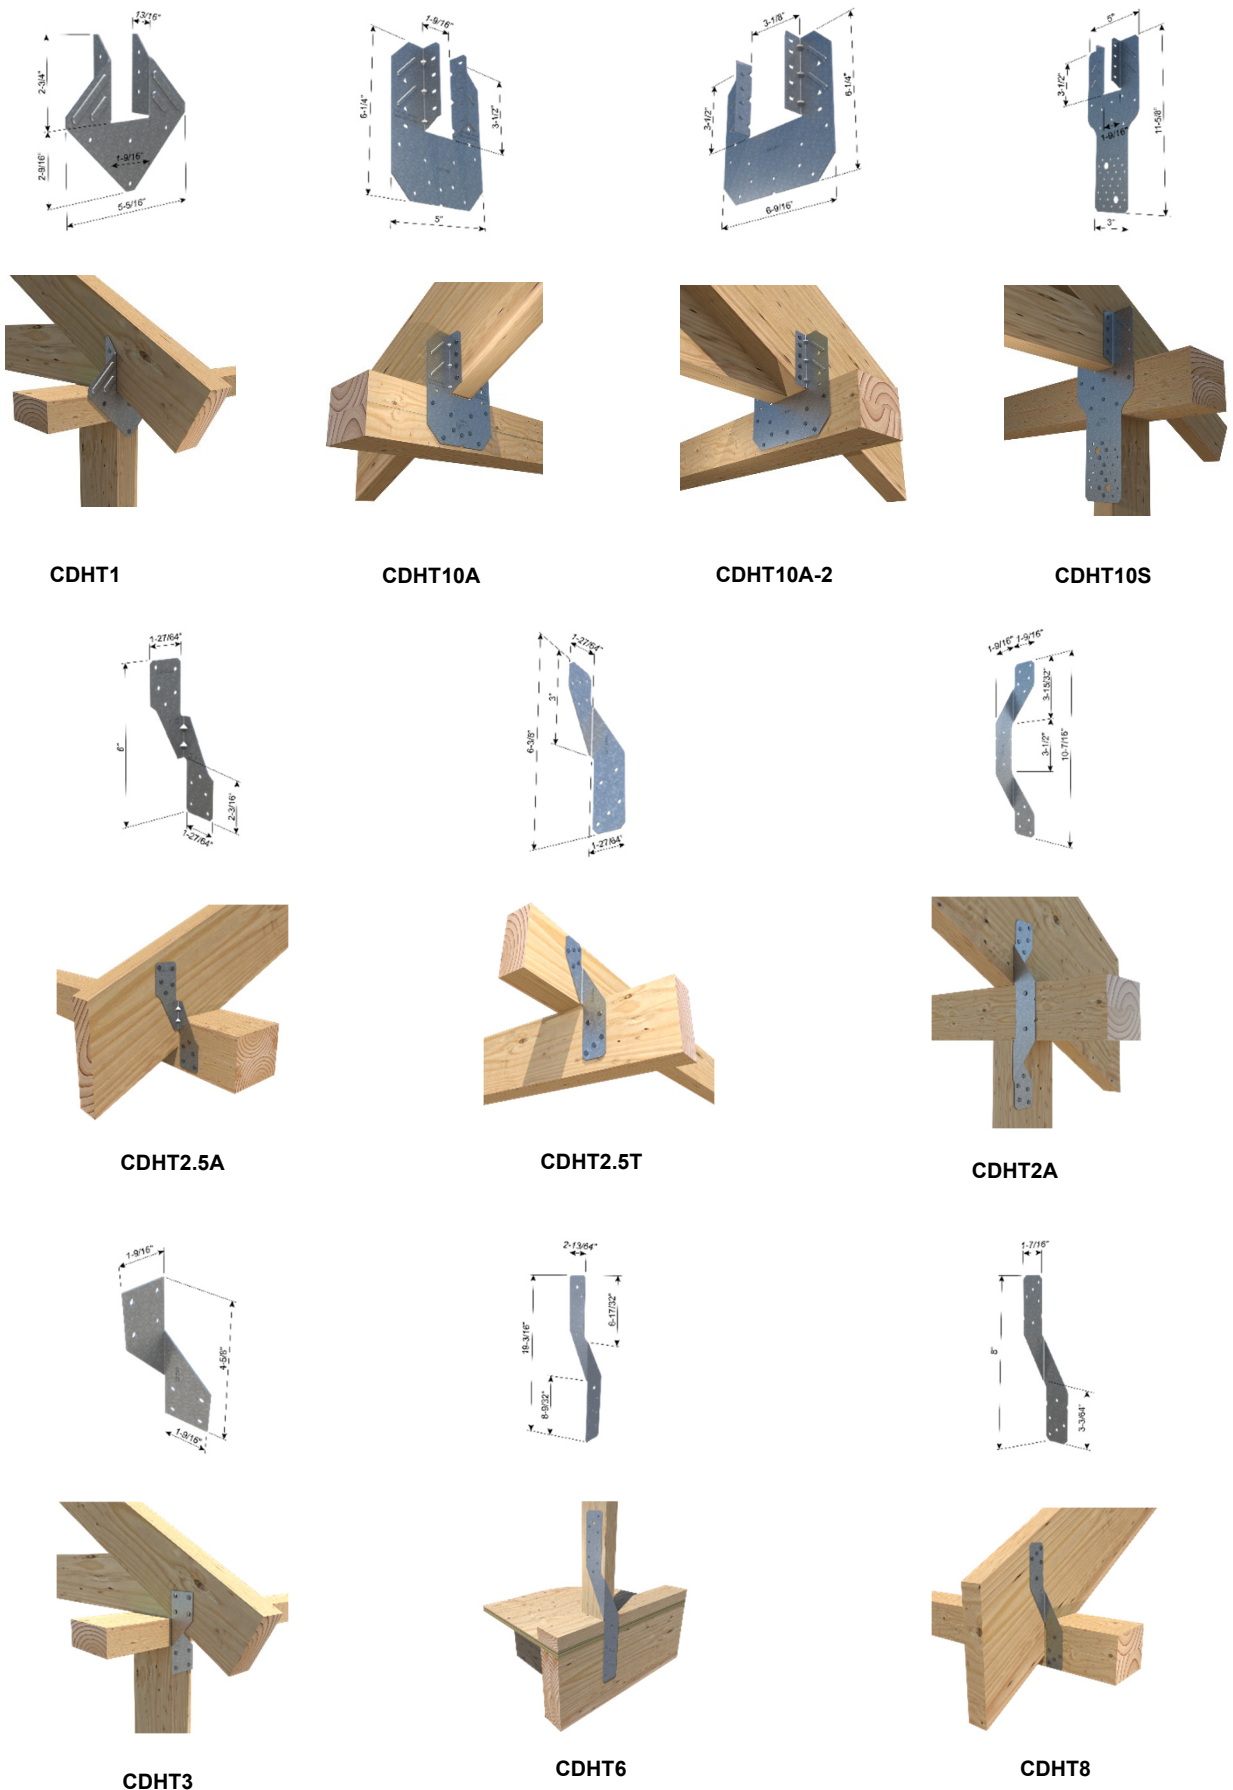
HURRICANE TIES AND TYPICAL INSTALLATIONS
